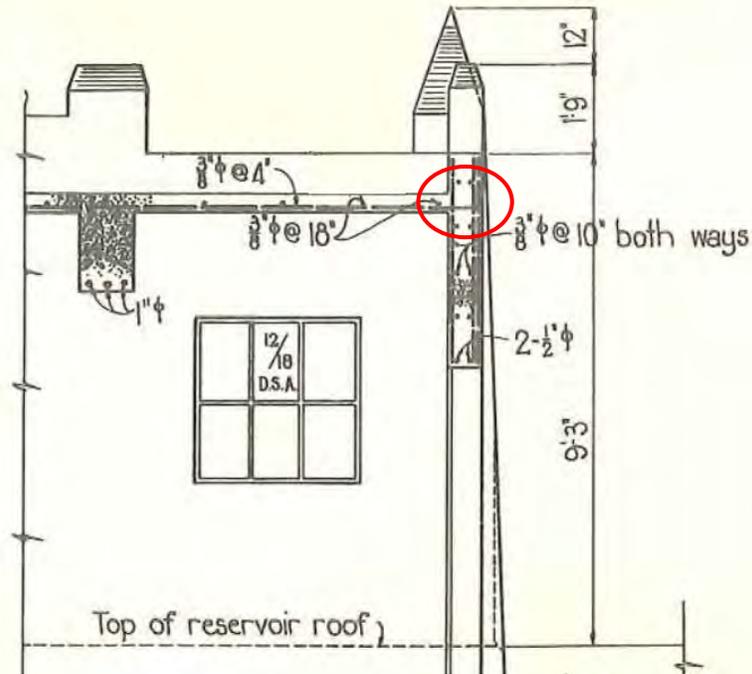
Inadequate Shear Wall to Diaphragm Connection
